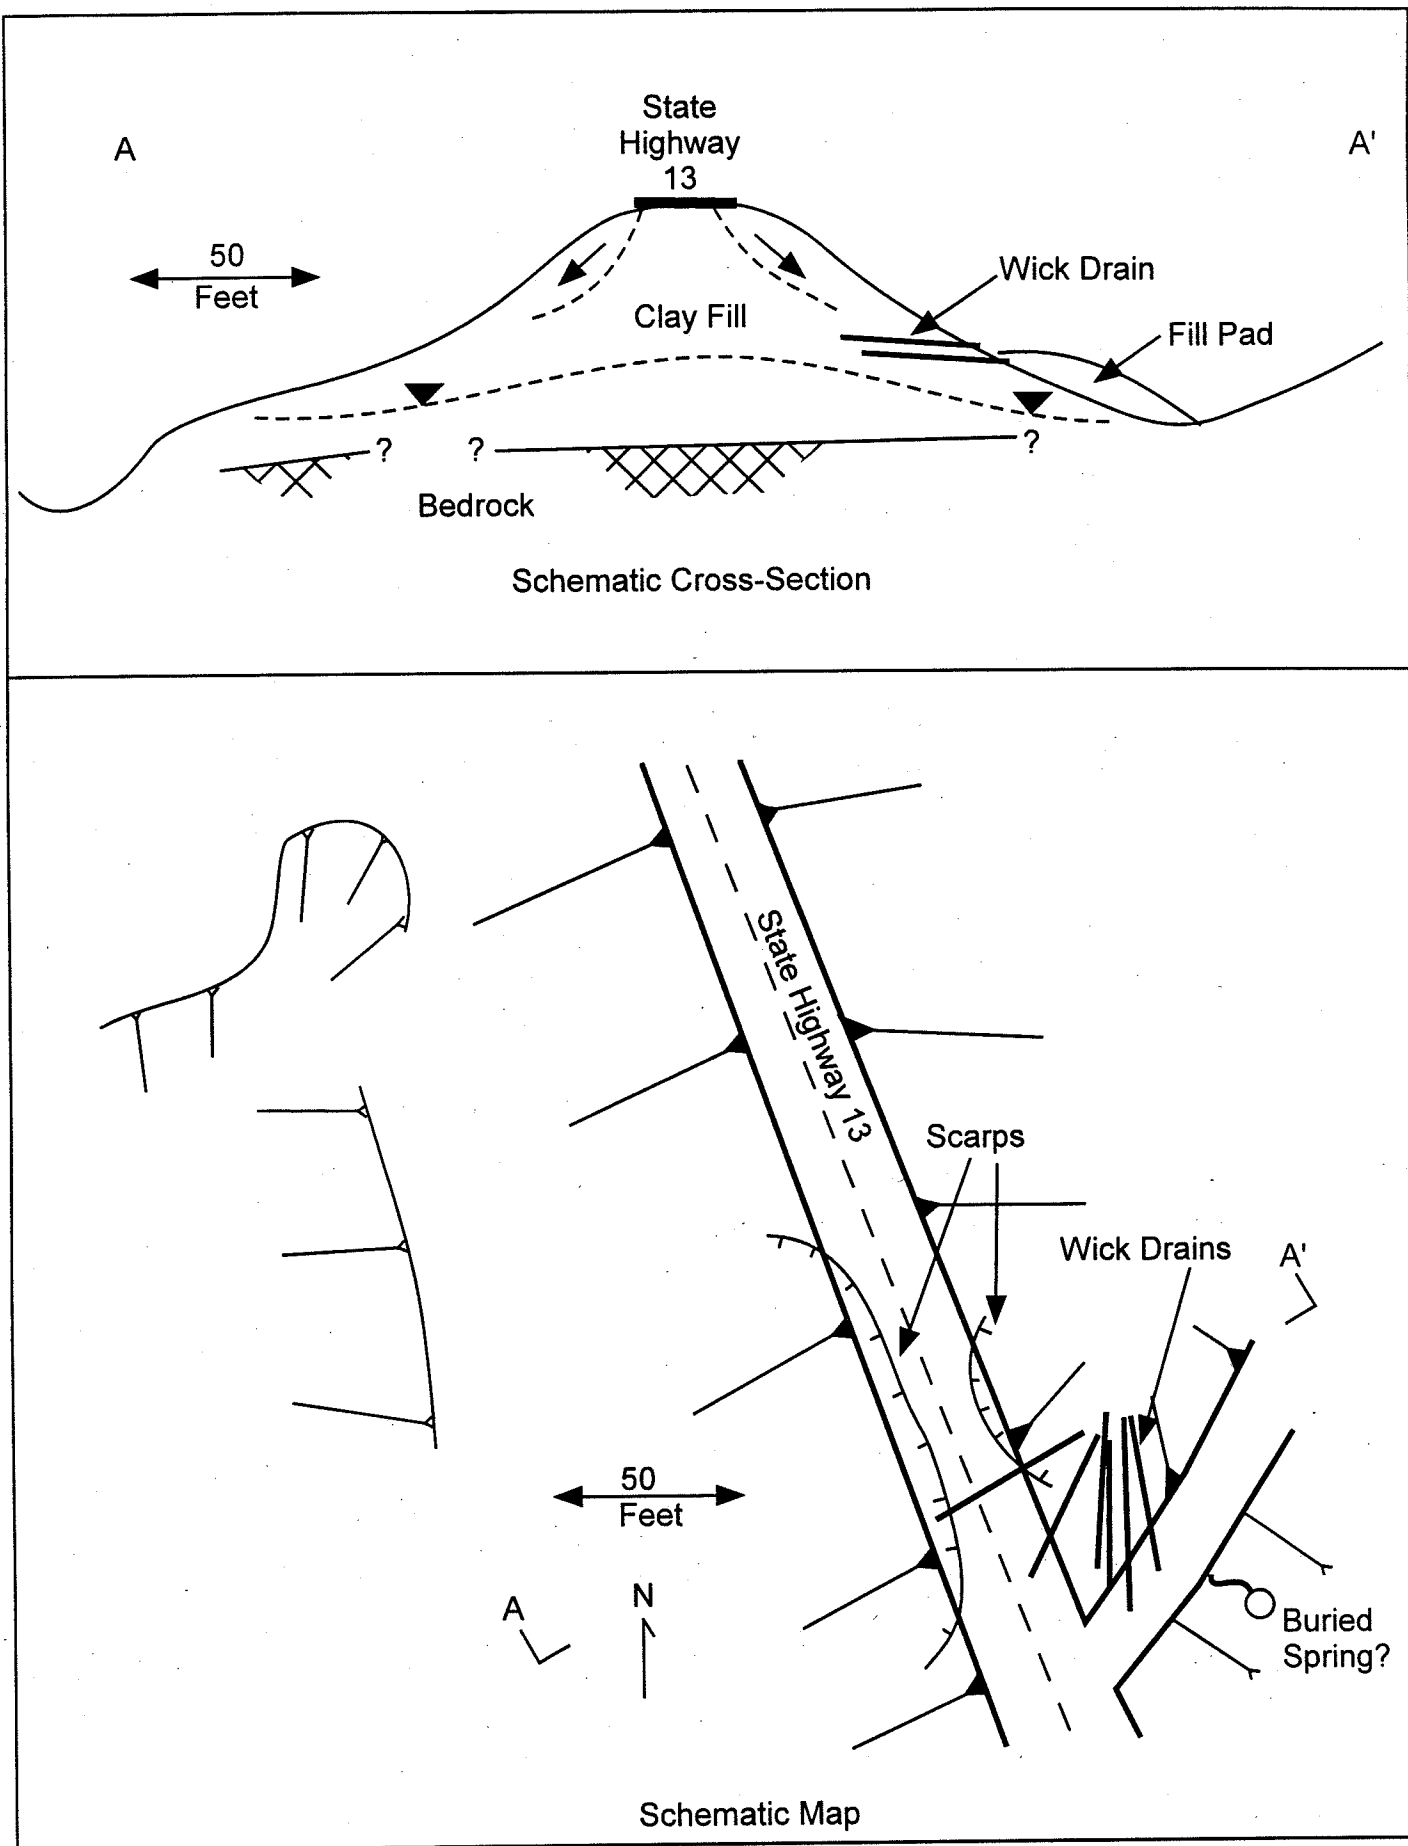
Schematic Drawings of the Rio Blanco, CO Landslide
